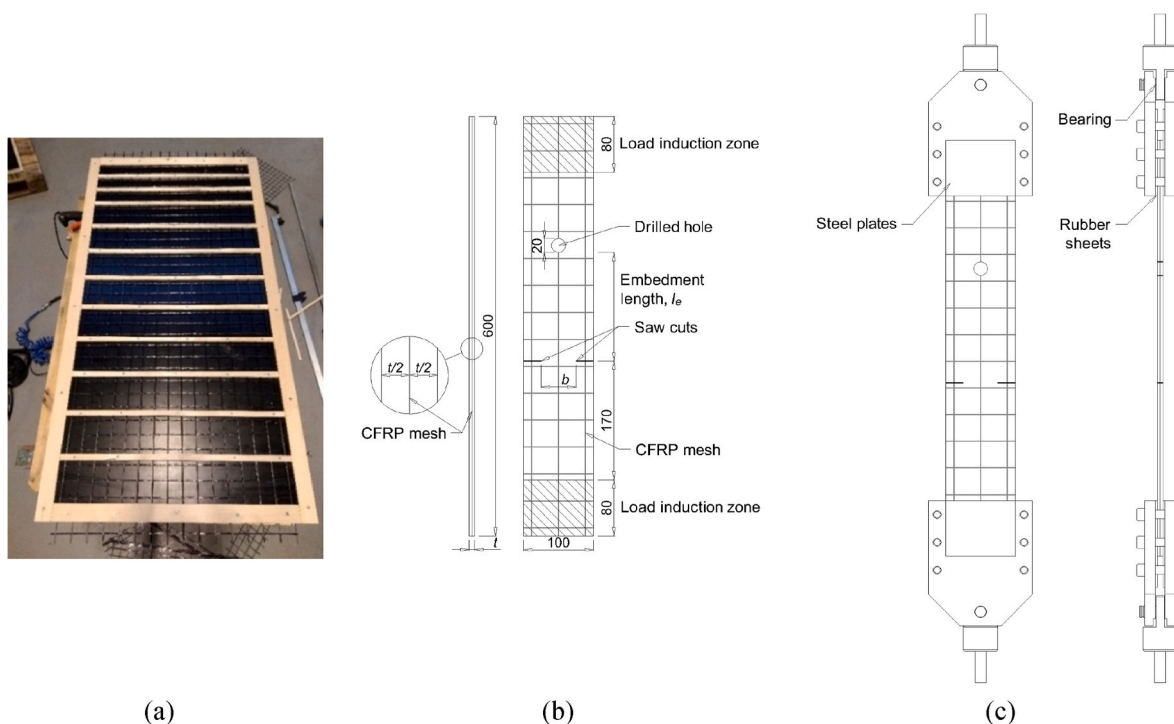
Pull-out tests; (a) Formwork with textile reinforcement mesh before casting (b) Drawing of specimens; measurements in mm; (c) Test set-up.
